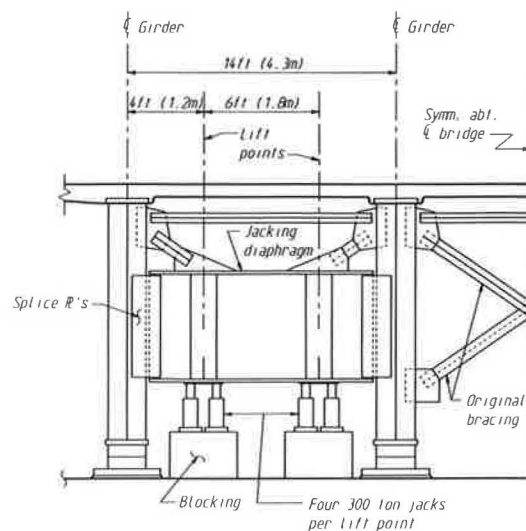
Jacking diaphragms at the intermediate pier, Pier 2.
